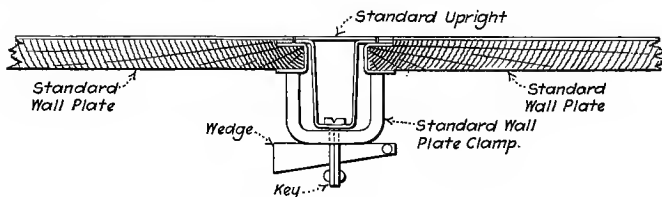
Section of Hydraulic Pressed Steel Co. form.
